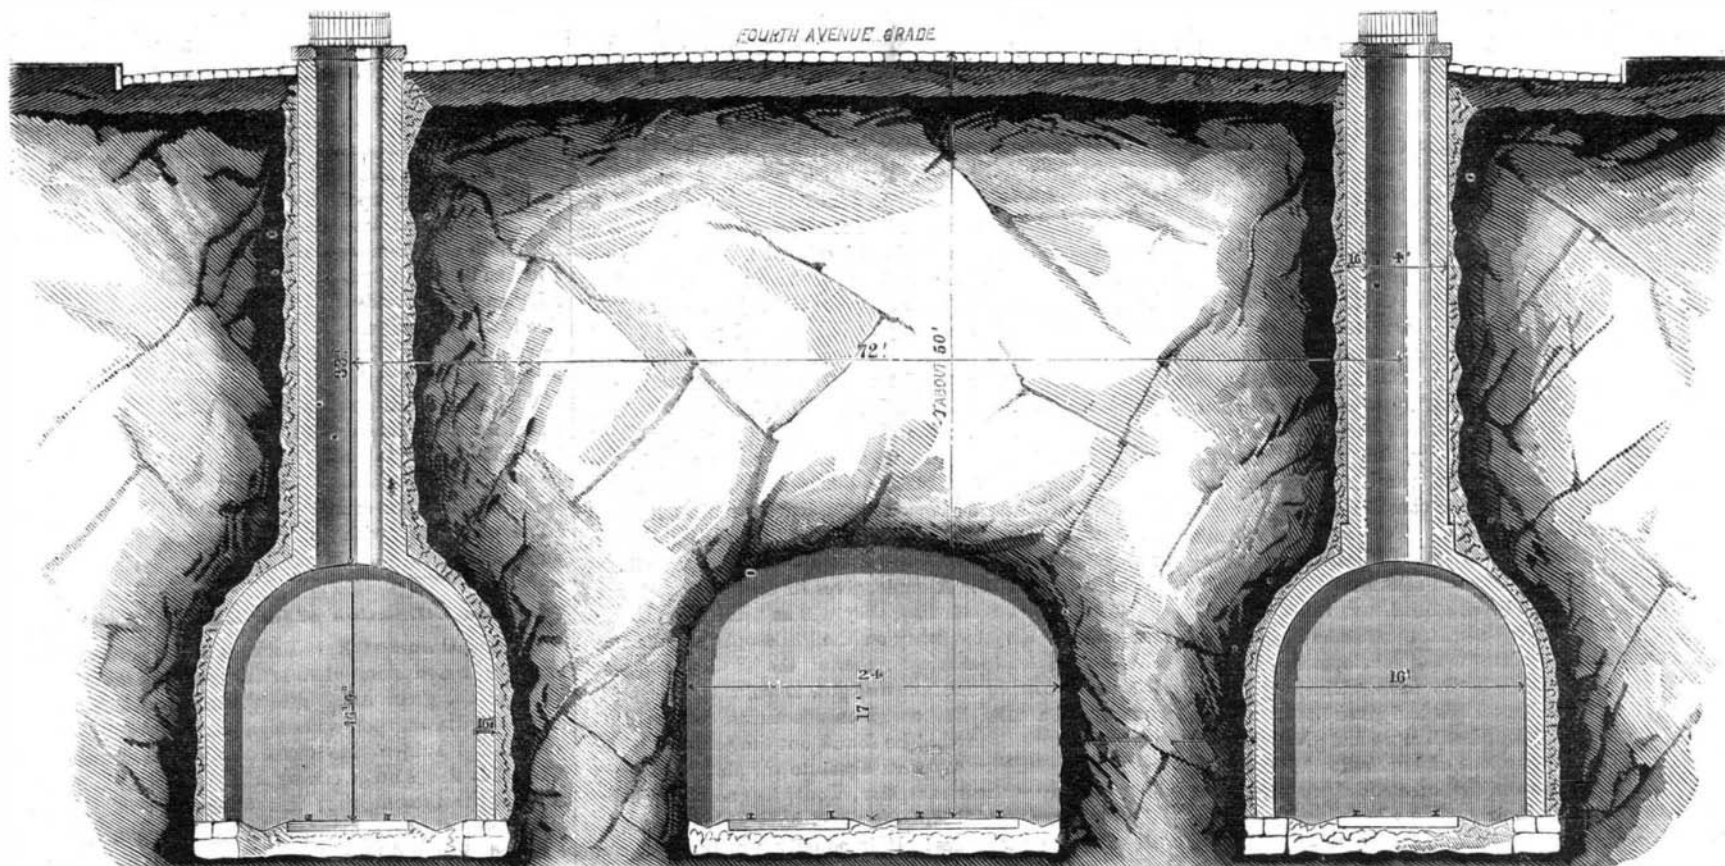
THE UNDERGROUND RAILWAY IN NEW YORK.—THE ROCK TUNNELS, FOURTH AVENUE, BETWEEN 92d AND 94th STREETS.
